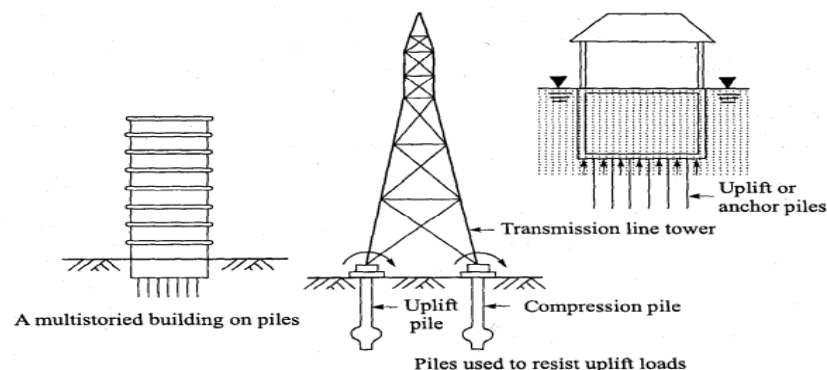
12 Piles for multi-storey buildings and to resist up lift loads (Source: V.N.S Murthy, 2007)
